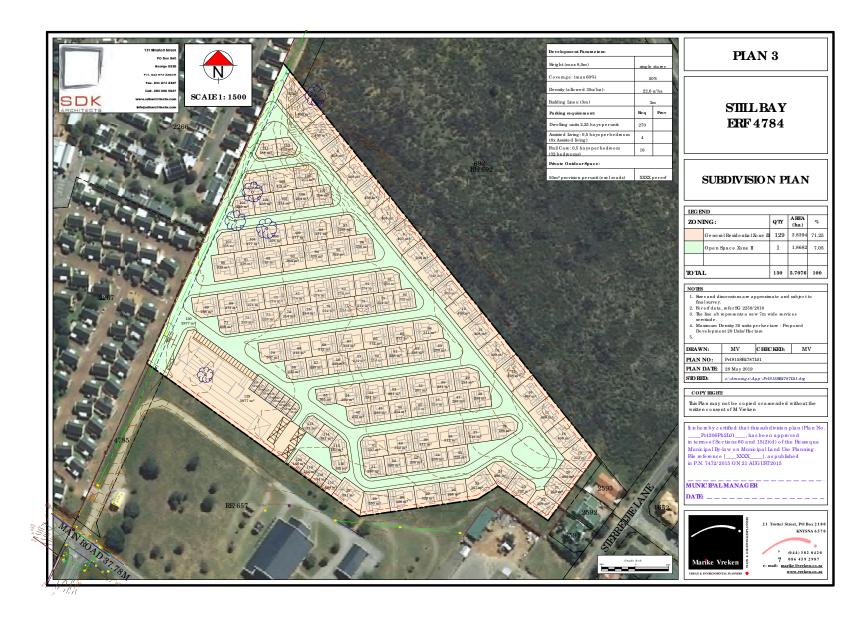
The Proposed Stilbaai Retirement Village Development layout plan
